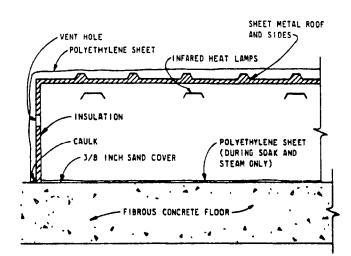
TYPICAL SECTION SHOWING ENCLOSURE FOR DRYING, SOAKING, AND POLYMERIZING THE STILLING BASIN FLOOR AT DWORSHAK DAM<sup>55</sup>
